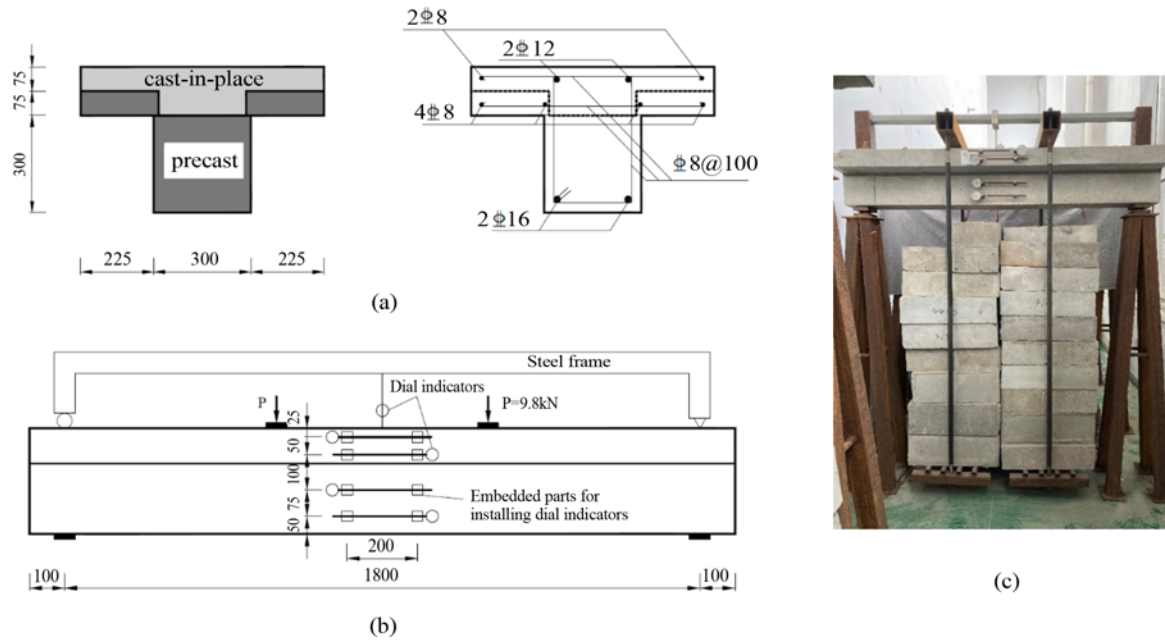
The Sustained Loading Experiment: (a) Section Dimensions and Reinforcement, (b) Dial Indicator Layout, (c) Experiment Layout
